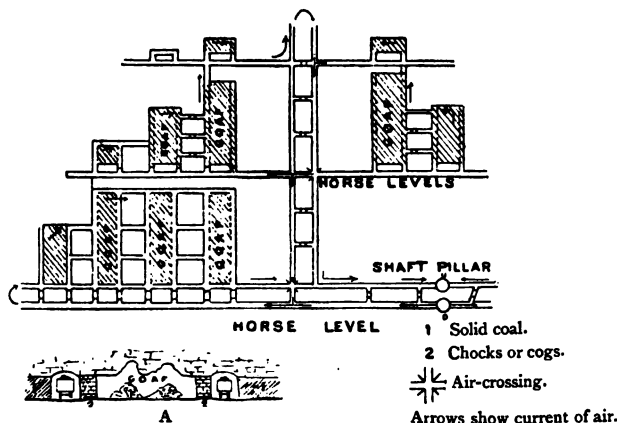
Pillar-and-stall, South Wales. A, section of double stall.
